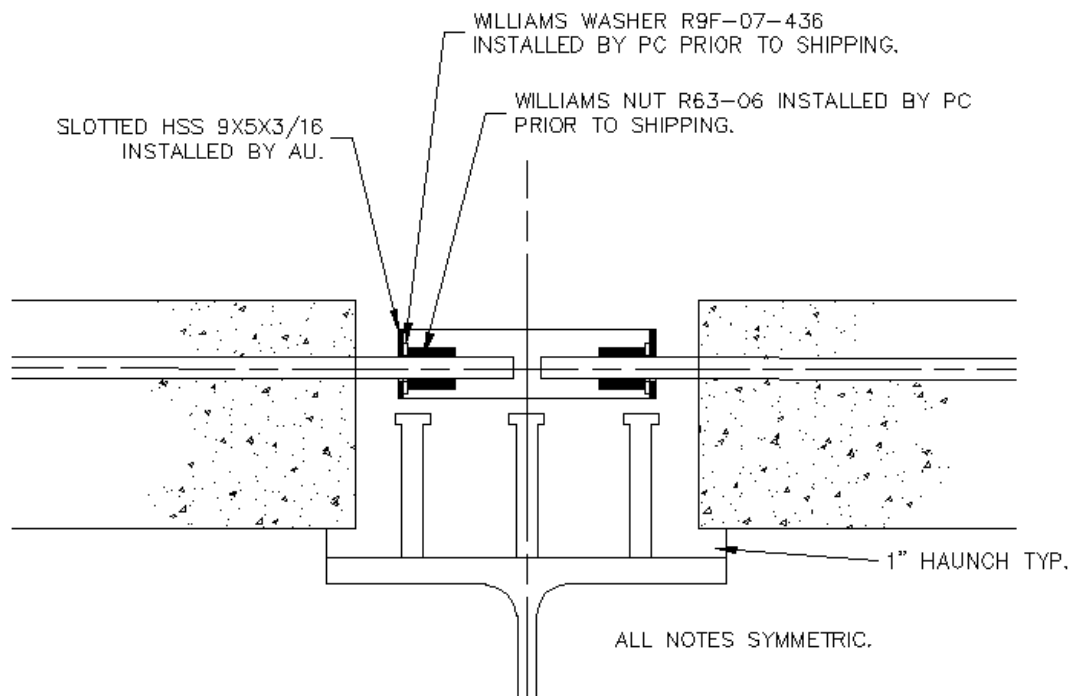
Staged Longitudinal Construction Joint Detail Elevation Prior to Placement of Confining Stirrups and Closure Grout
